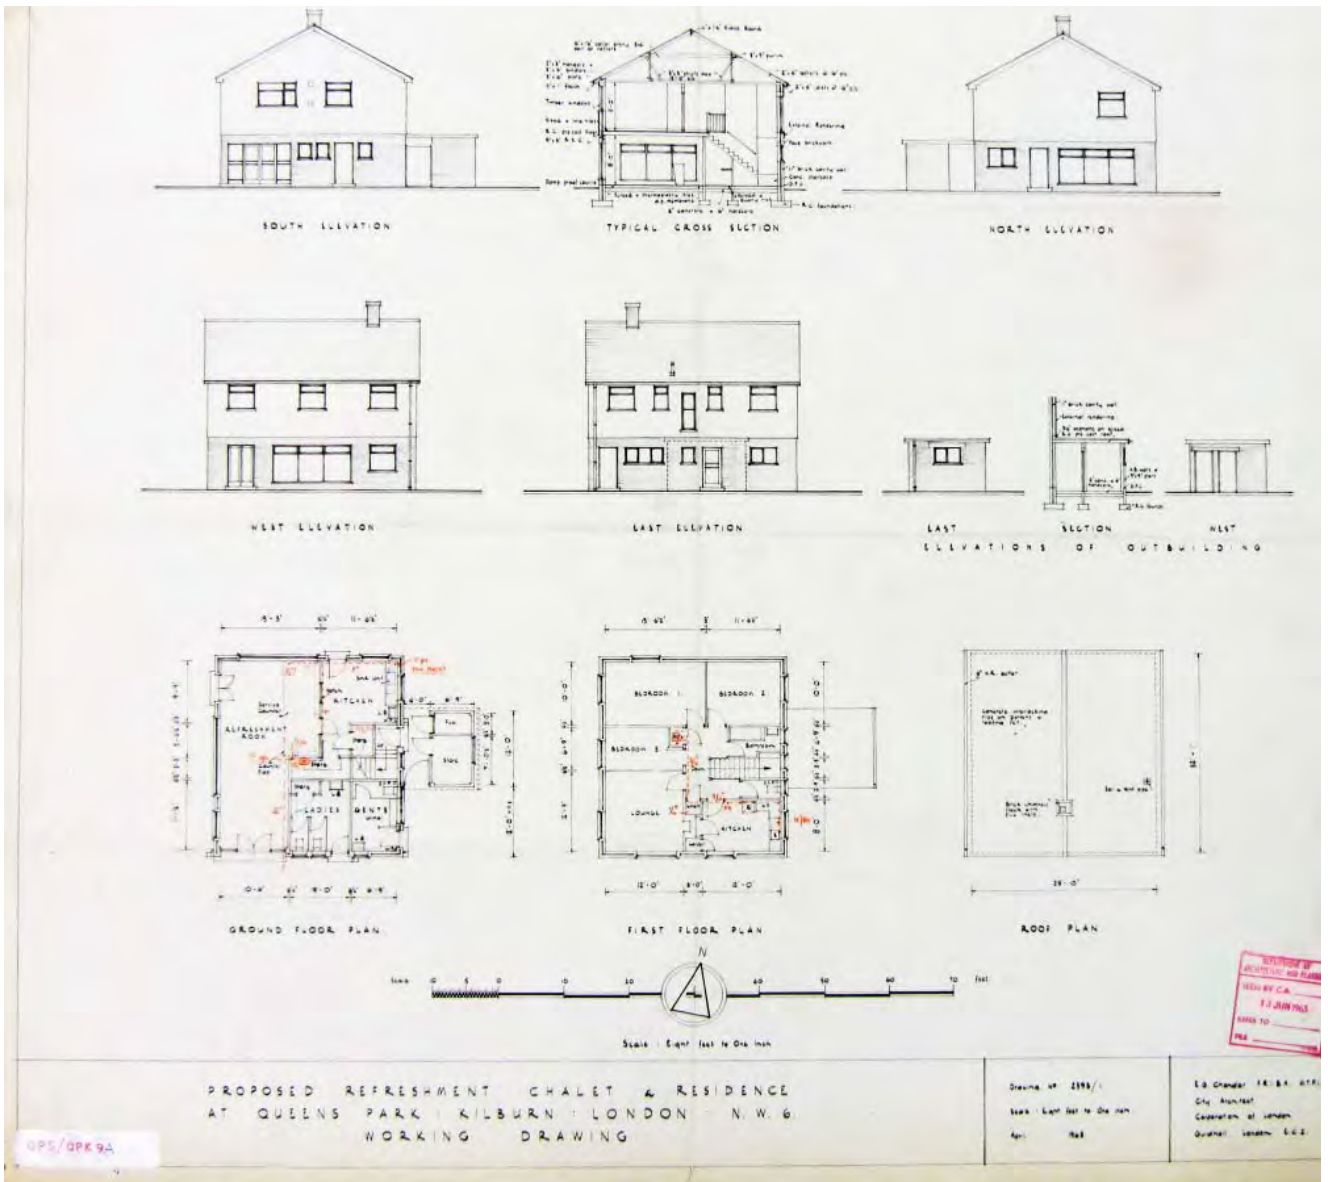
Elevations and floor plans of Refreshment Chalet and Residence 1963
